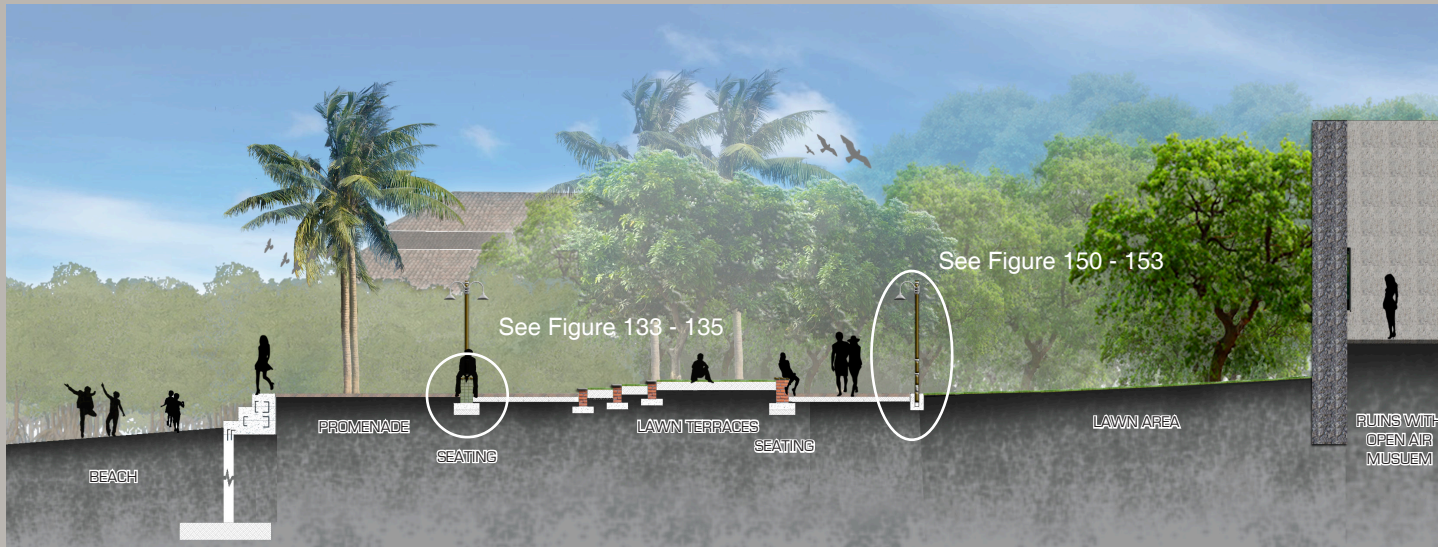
Detail Section Elevation through Beach, Waterfront, Ruins and Museum signage (E-E) (Author, 2014).
